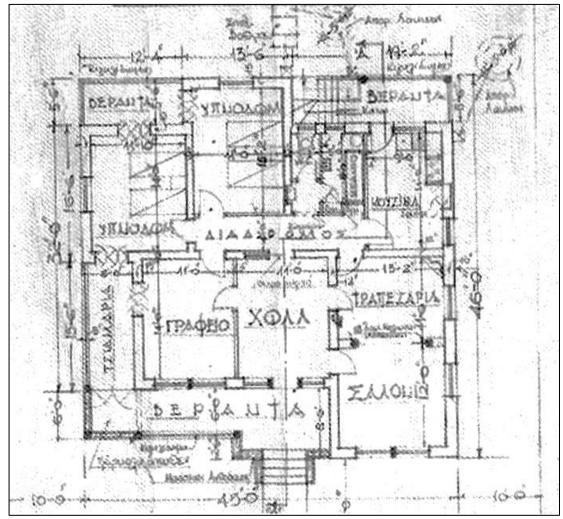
A Typical house project floor plan designed by PWD Architect Andreas Meletiou (RIBA) in 1951 (Georghiou, Late Colonial House at Pavlos Nirvanas Street, Nicosia, 2013)
